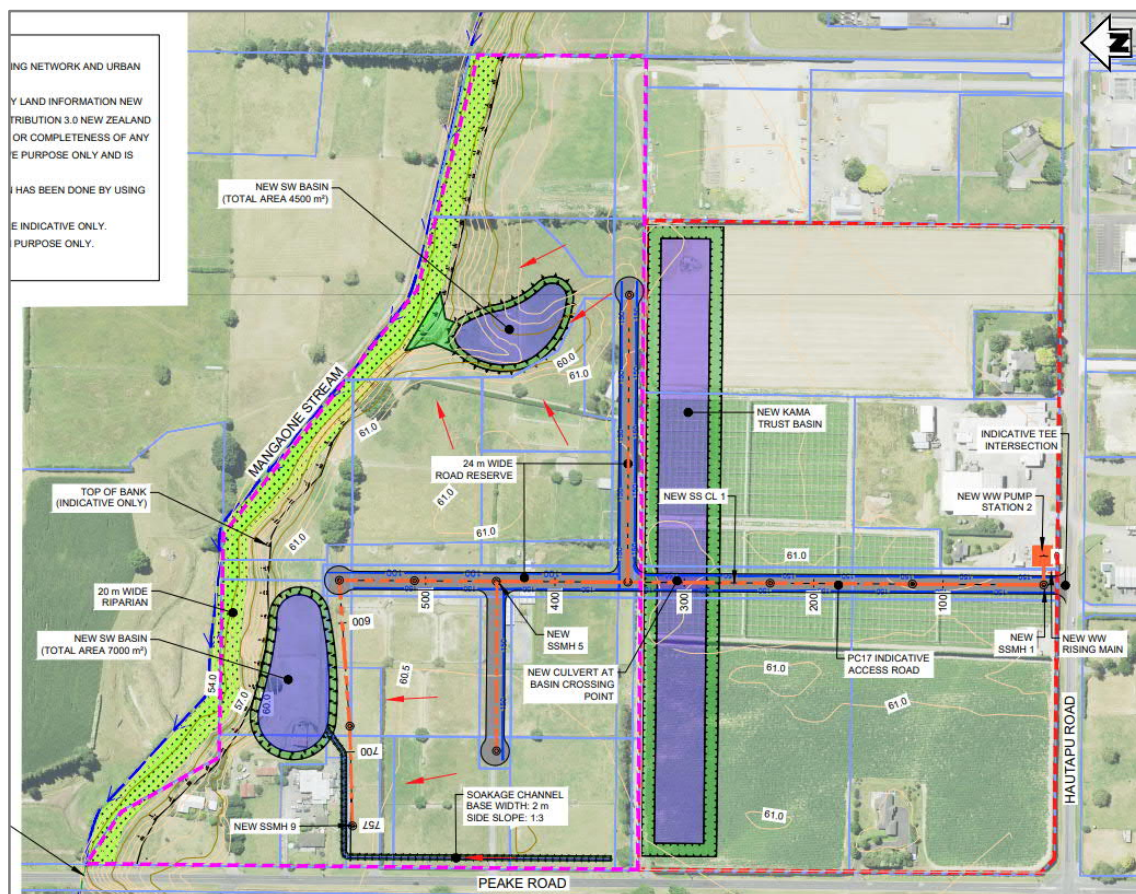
Potential Hautapu Structure Plan integrating Area 6 and the HLG land (Area 7).
